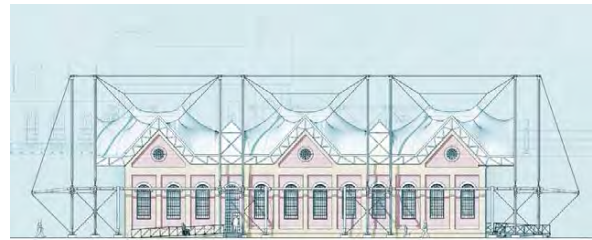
Elevation of renovated Power House, part of a proposal at Crumlin Navigation Colliery for Renewable Energy Storage Facility (Luckman, R., 2022)
